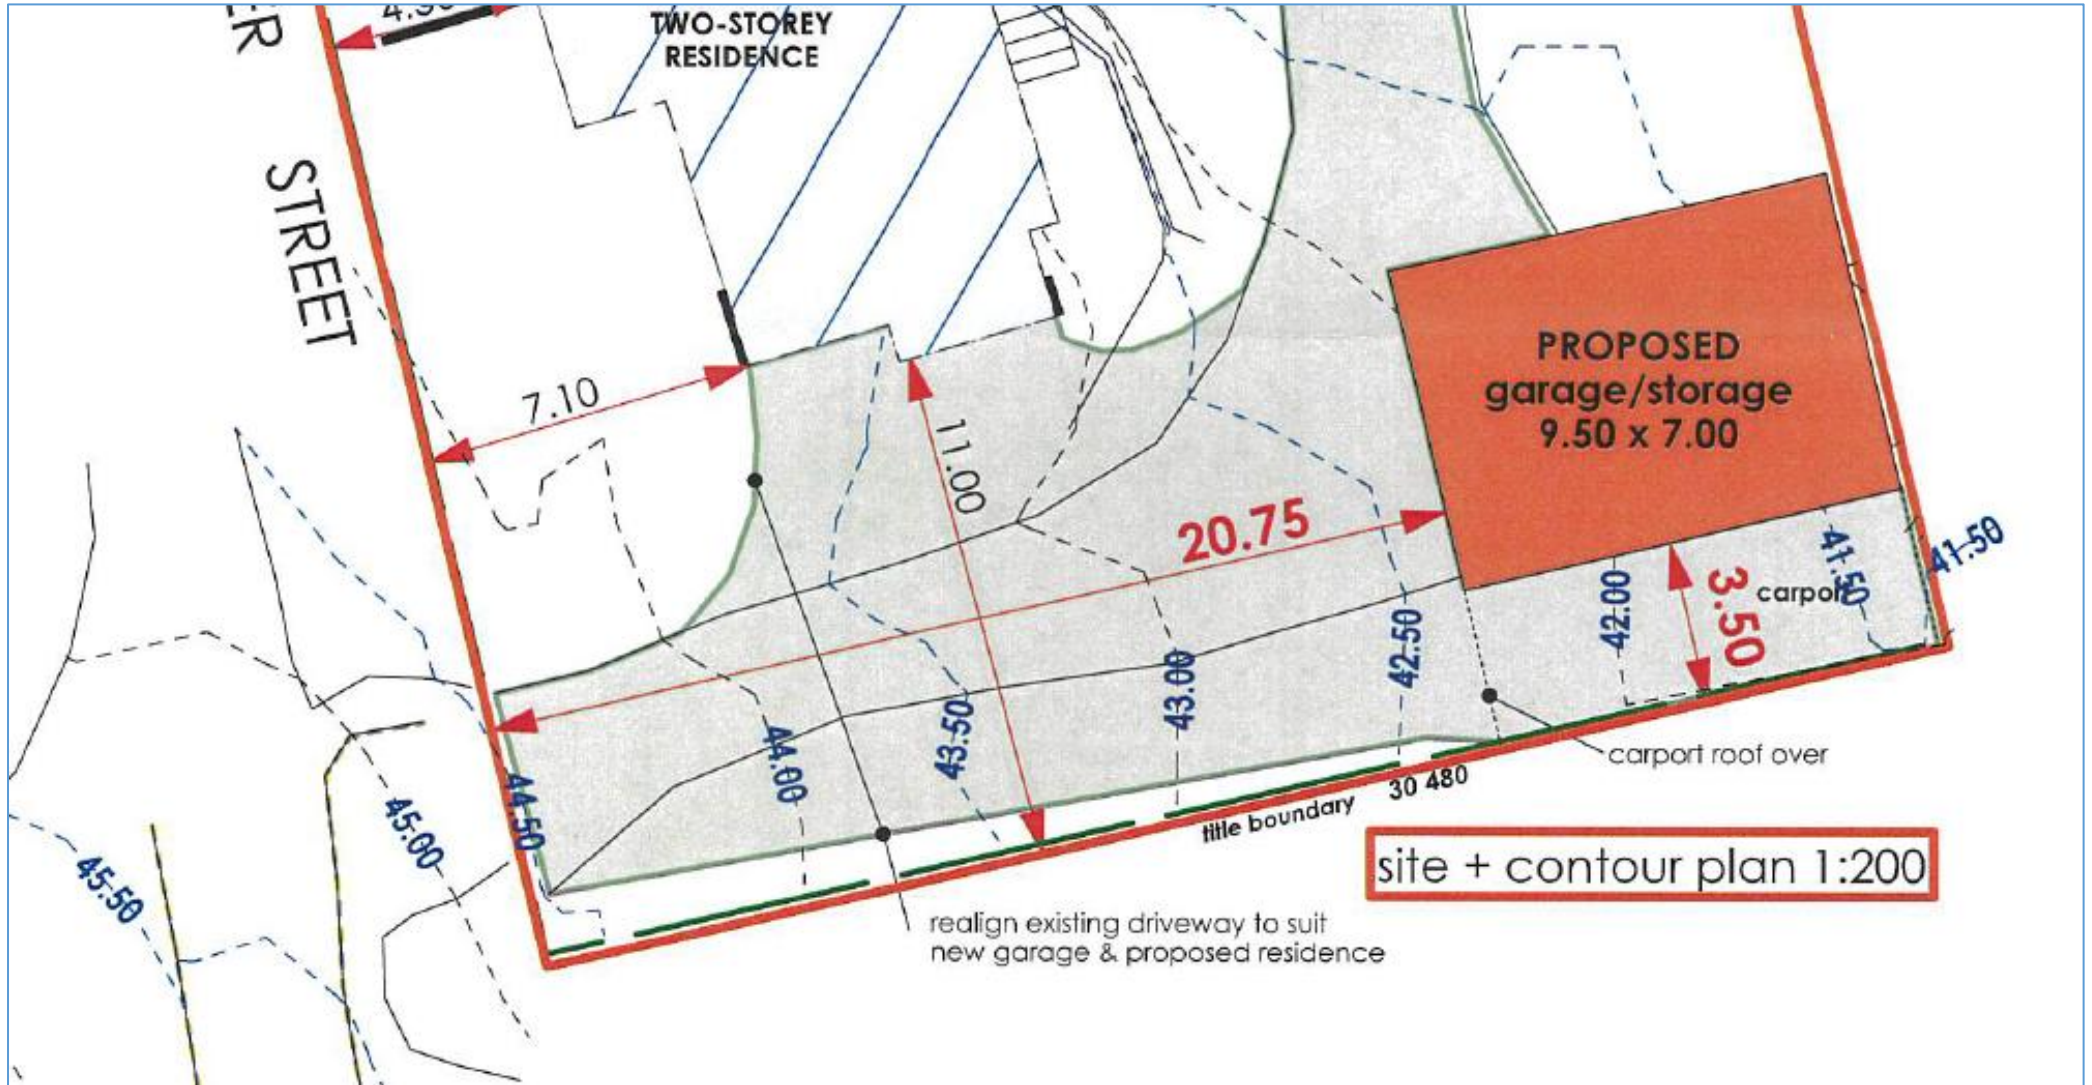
Site Plan of Proposal within 64 Walter Street Bridport
